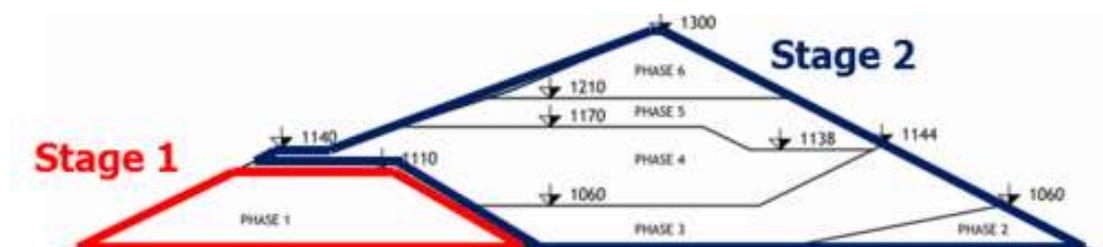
Longitudinal cross section with construction stages 1 and 2
